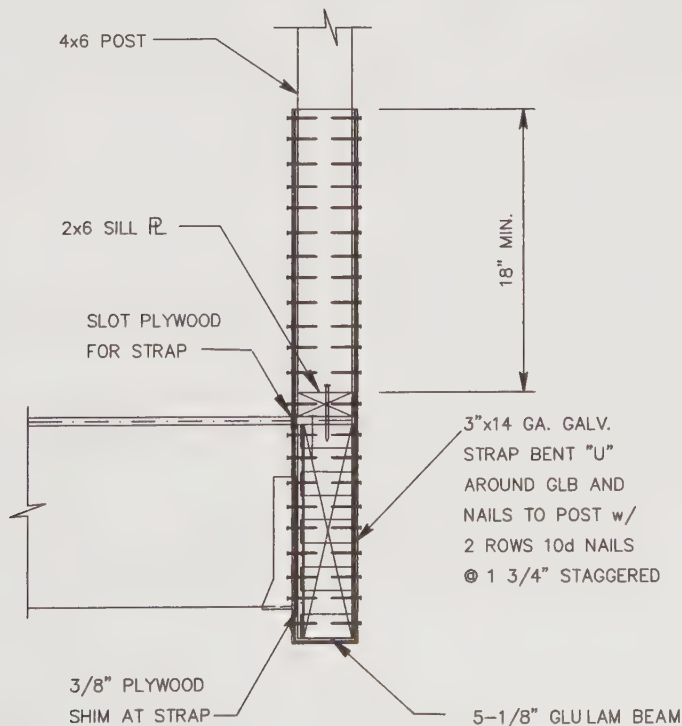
A-16. Detail of anchorage at point A (see also Figure 1A-14)
